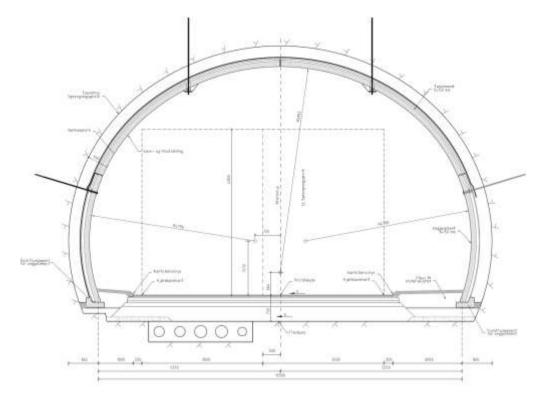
Alternative cross section, with a 2 m wide right hand side shoulder, equivalent to a cross section of T10.5 m
